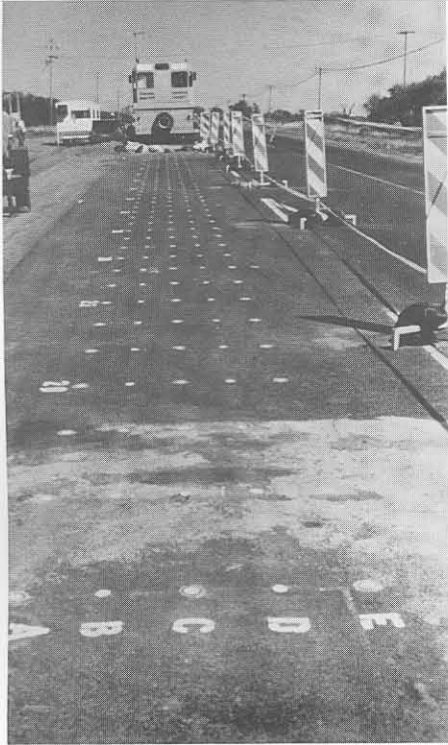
RELATIVELY DEEP PAVEMENT: ROAD 1932 – EXCESSIVE CRUSHING FAILURE AT THE END OF THE TEST (48 000 REPETITIONS) ON HVS TEST SECTION 337A4 (TRAFFICKING SINGLE WHEEL LOAD: 150 kN; TYRE PRESSURE: 1445 kPa).
